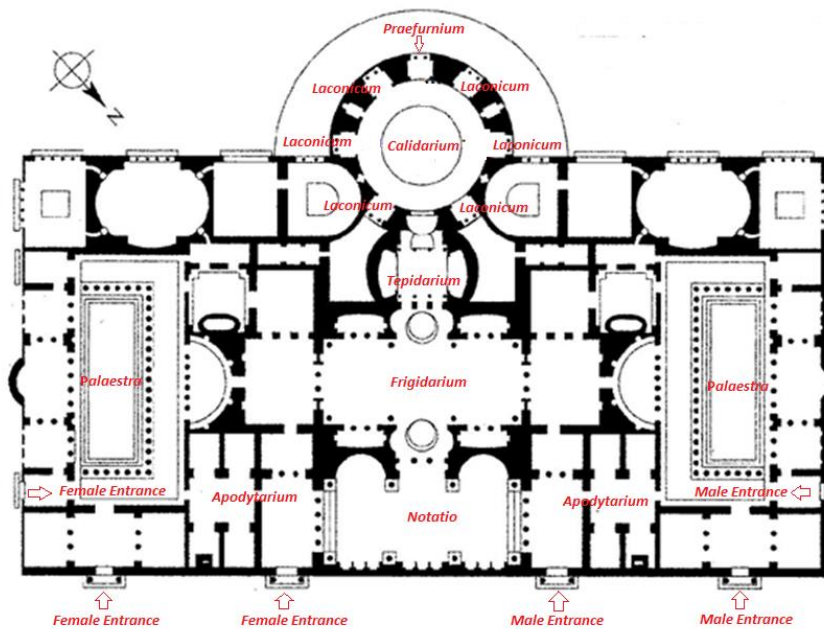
A Bathhouse Complex of Caracalla showing a Generic Layout Plan
